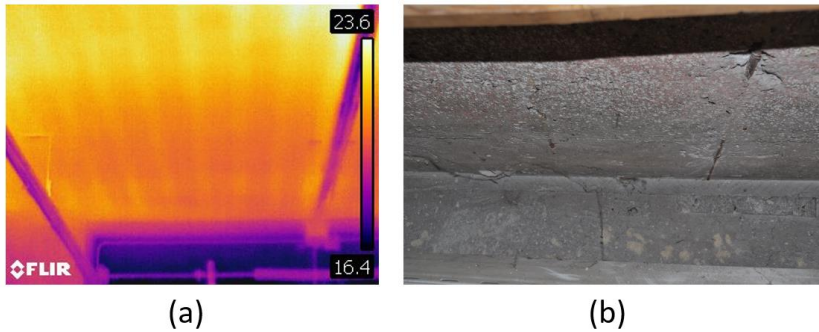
a) IR image of weaving floor; b) detail of concrete curb
